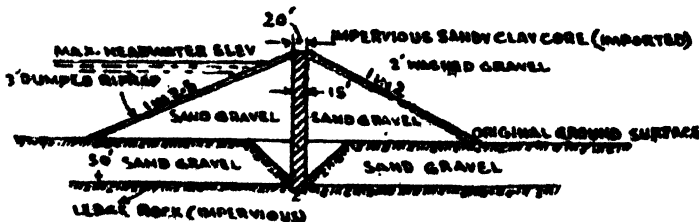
Suitable design for a site where only sand gravel and foundation is pervious to depth of 50 ft.
